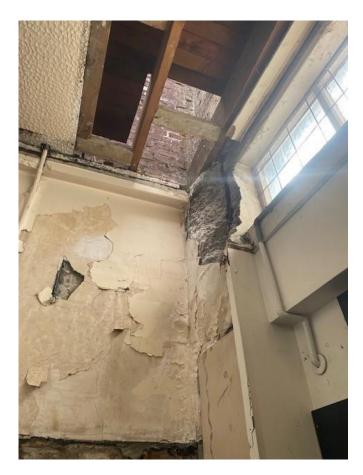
Existing column where significant breakout has occurred due to corrosion of existing reinforcing steel.
